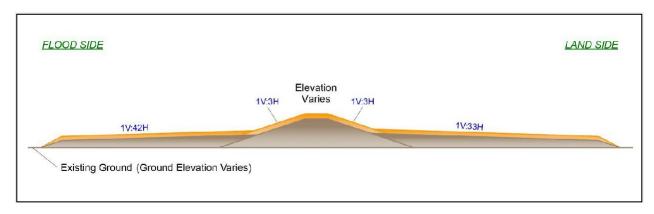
Typical Cross-section with berms for First and Second Lifts for West Slidell
